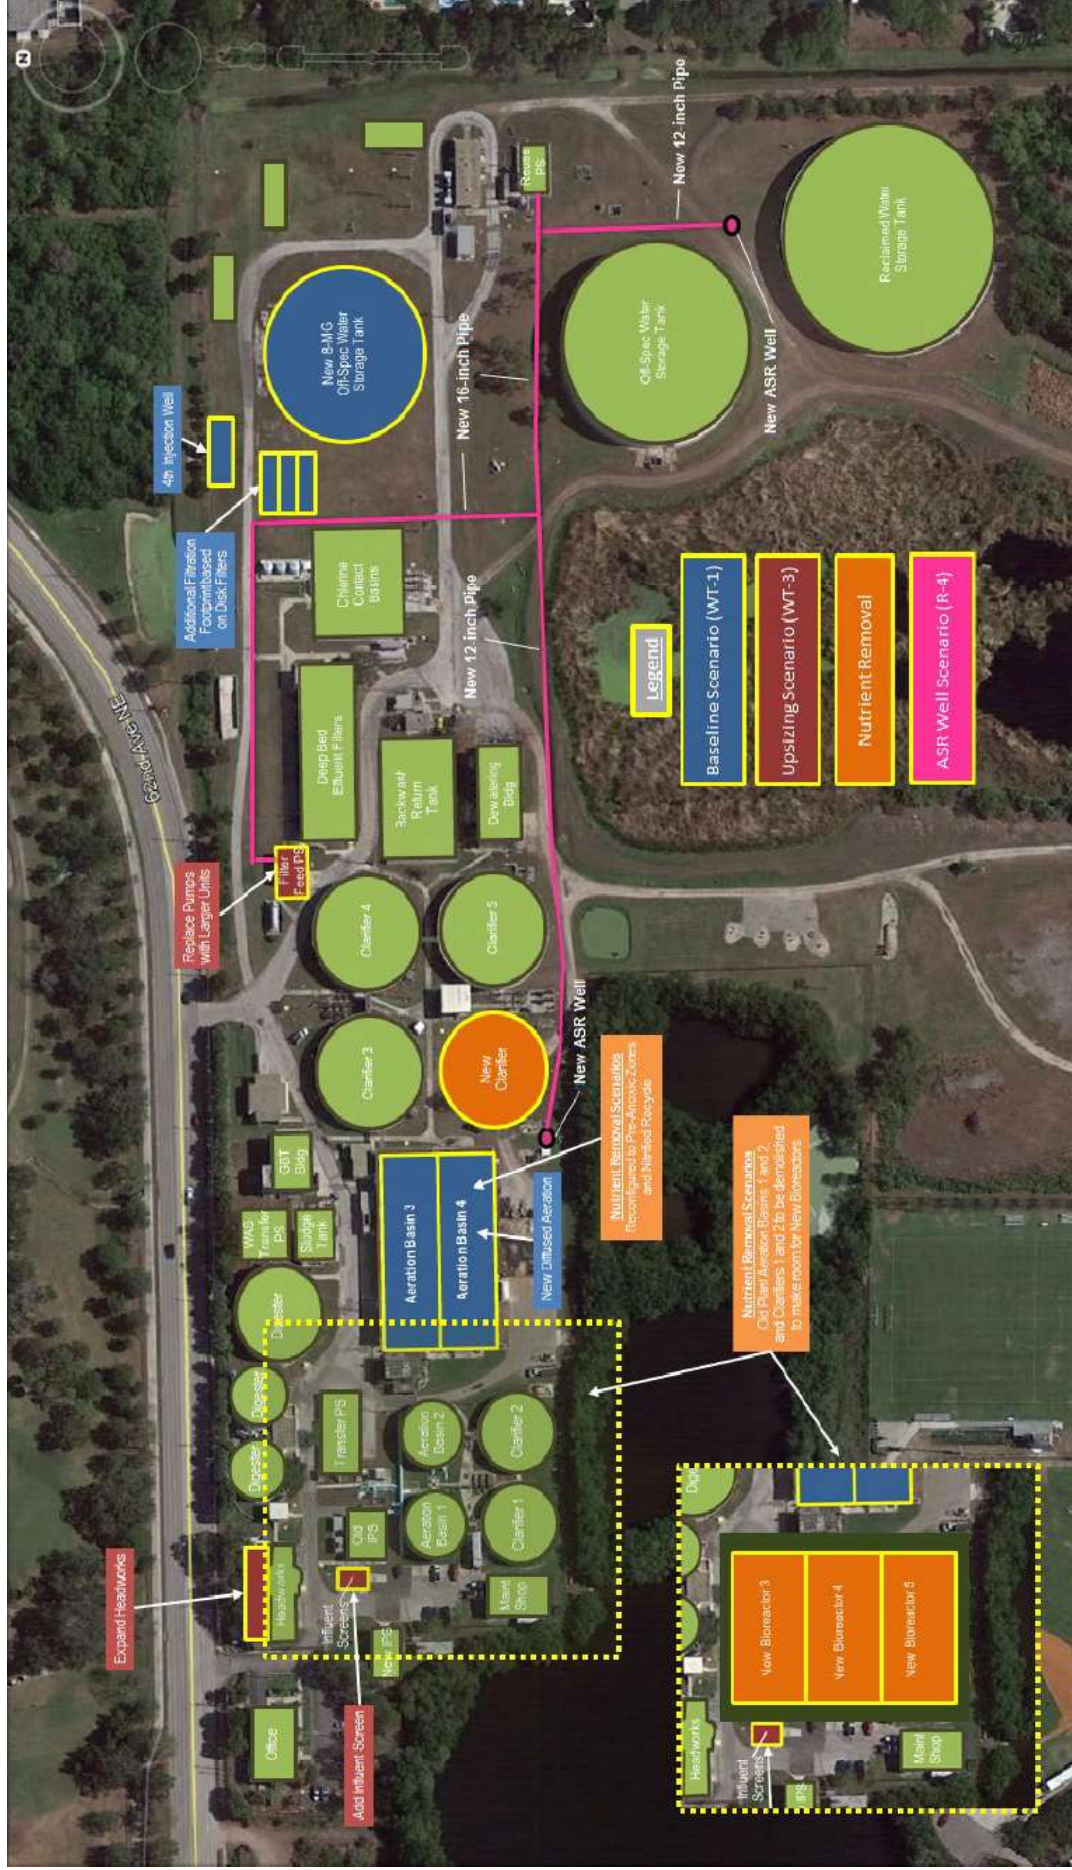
Site Layout Plan for the Northeast WRF
